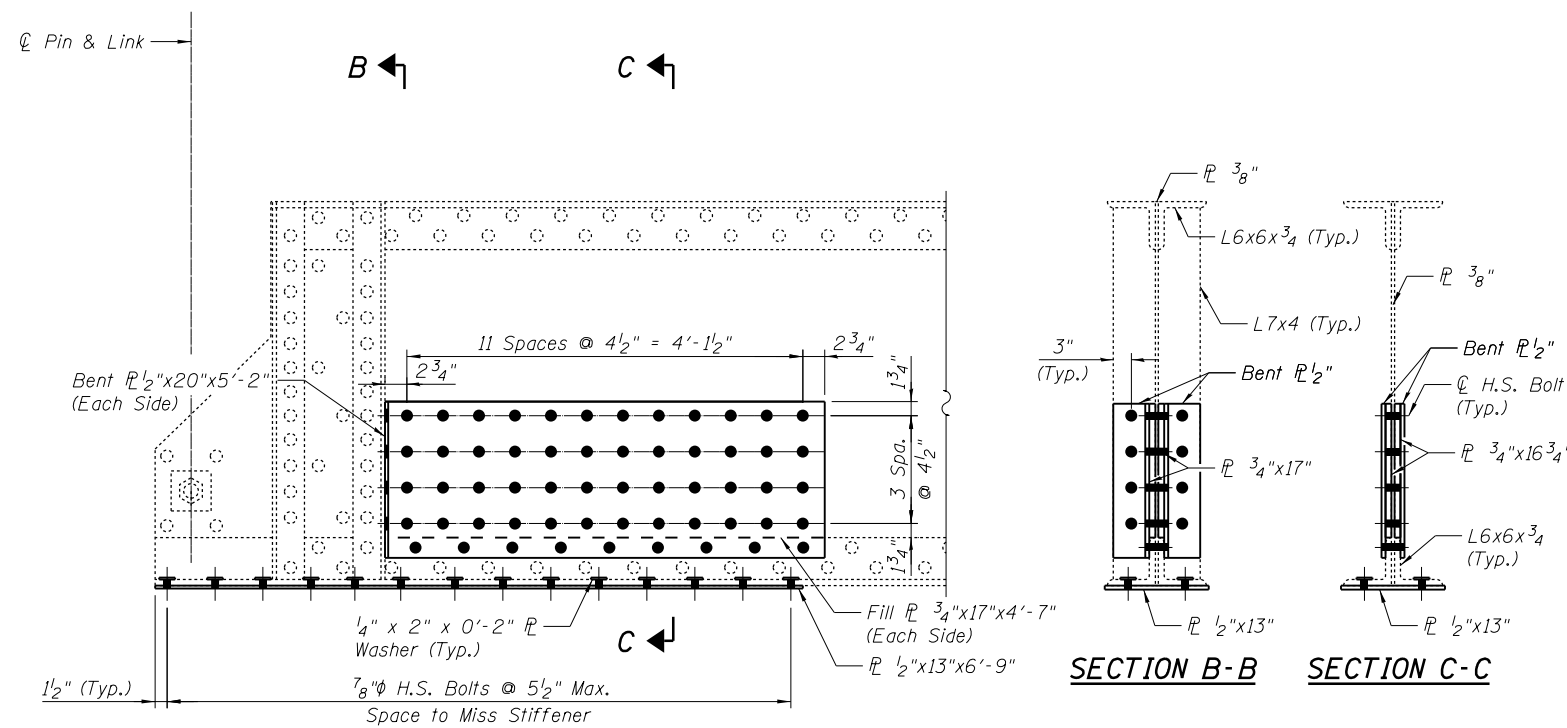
LOCATION AND PLATE SIZE SUMMARY
